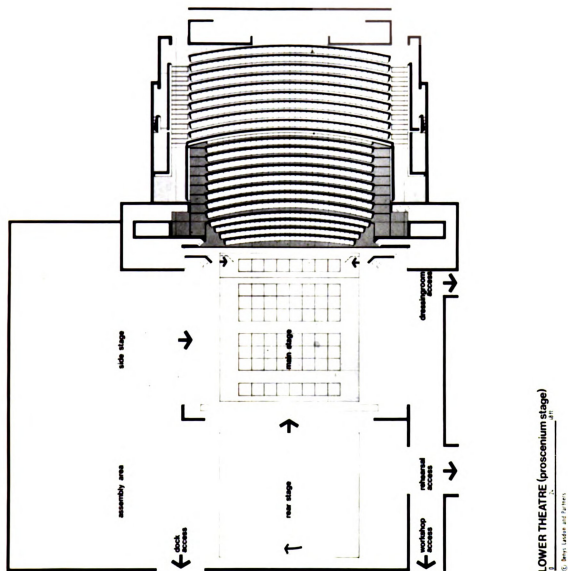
Floor Plan of the Lower Theatre (proscenium stage)
